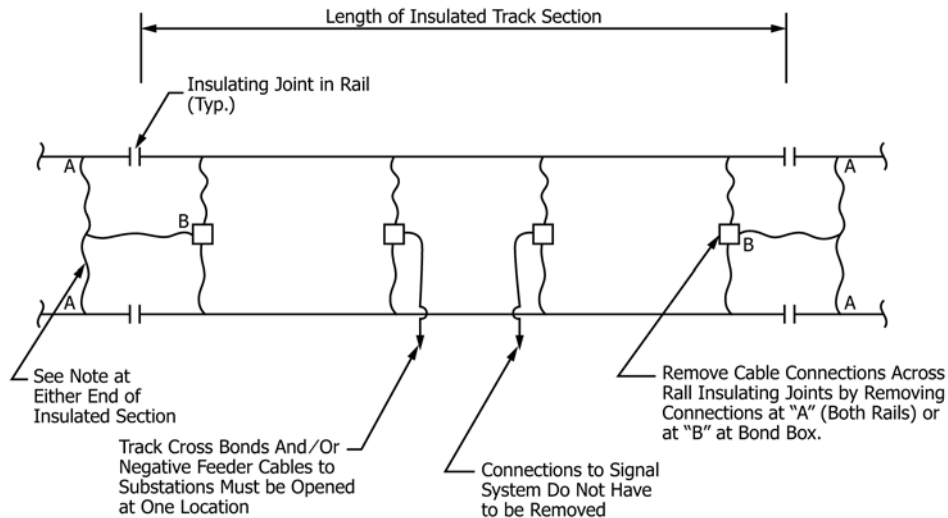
Schematic Diagram — Typical Mainline Track Section
